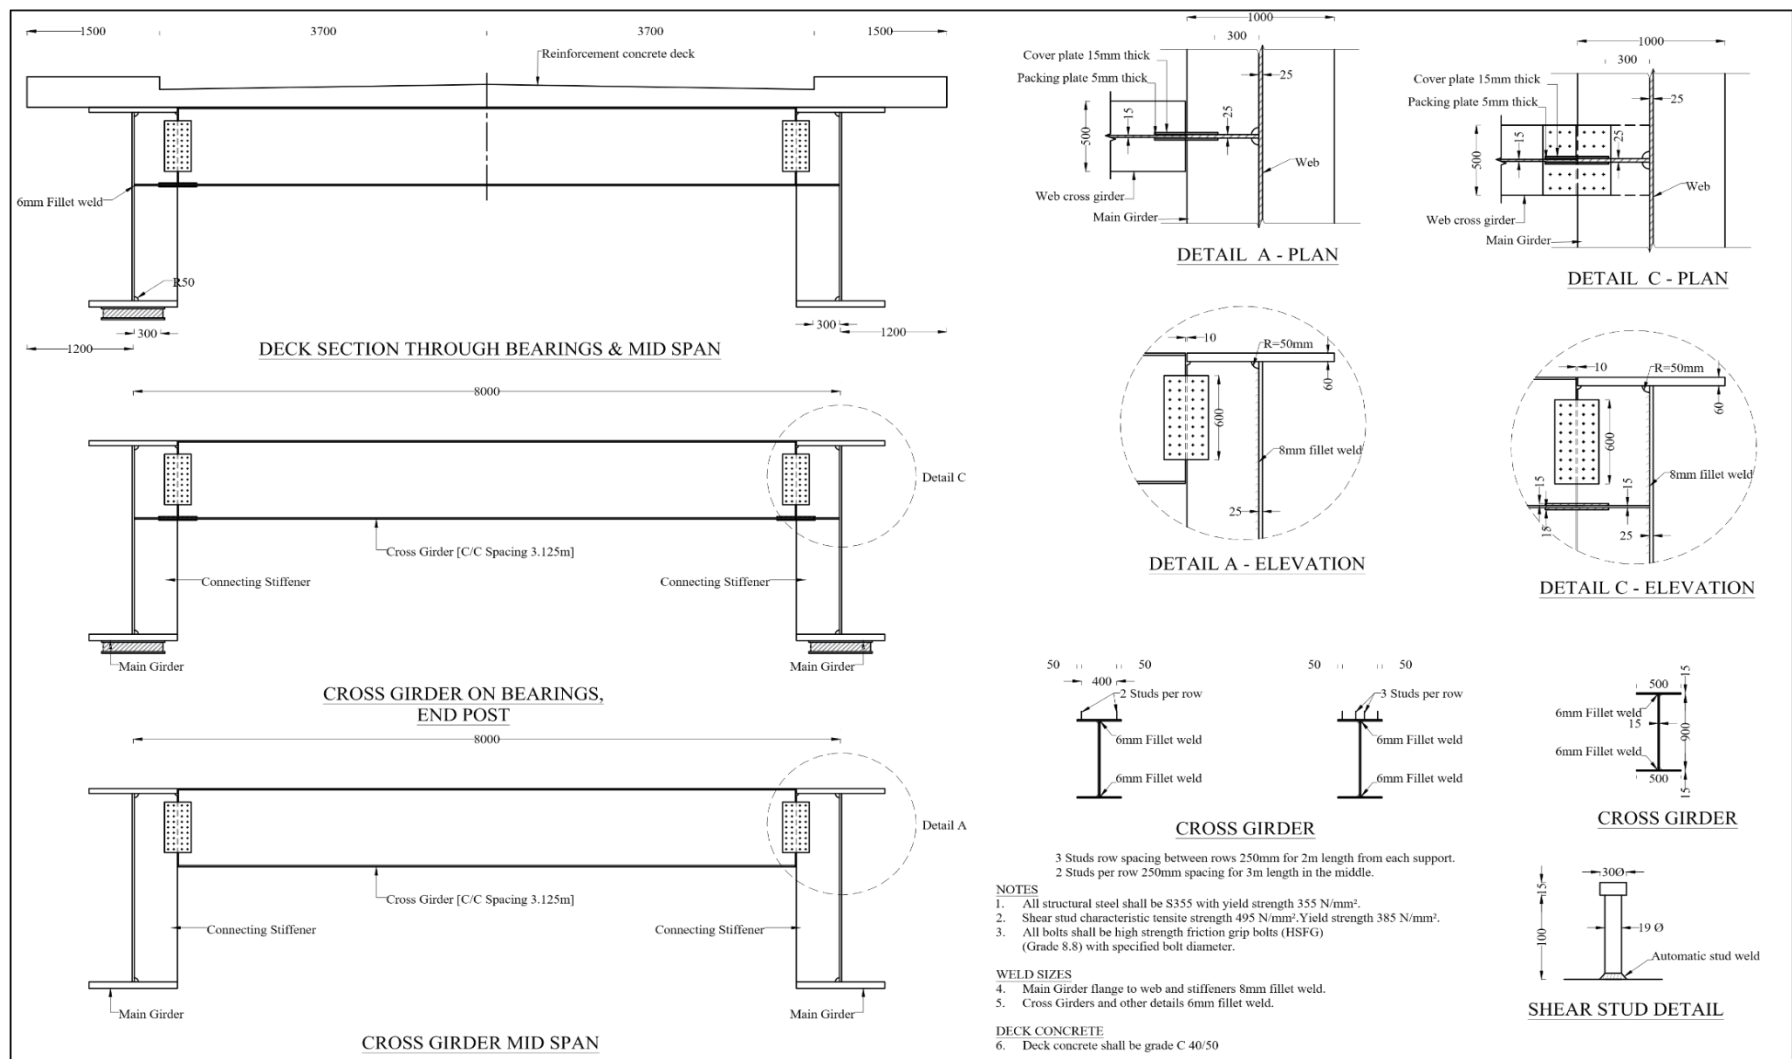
11 STEEL CONCRETE COMPOSITE LADDER DECK SPAN 50m
